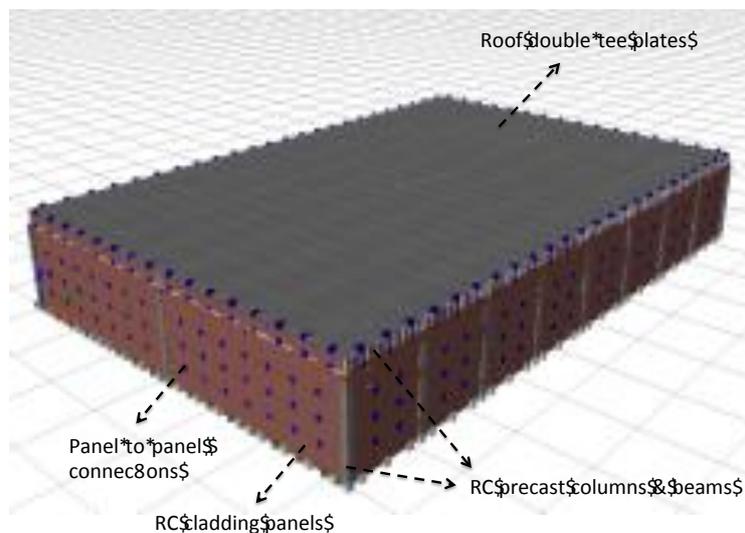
A 3D numerical model of a benchmark RC precast structure used in verification of the proposed design approach
